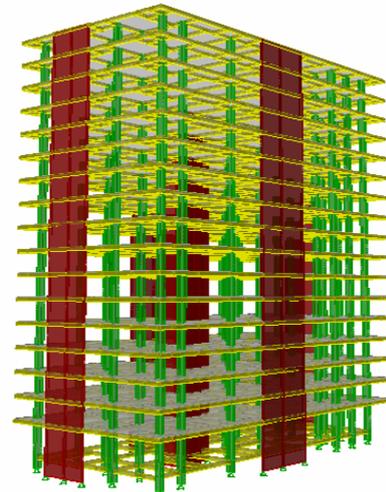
Elevation view of building with soft story at bottom with shear wall in ETABS
